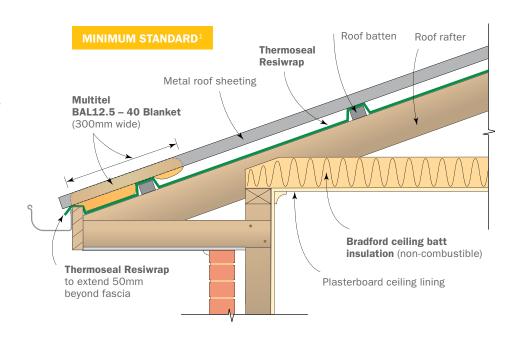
b Fascia Detail – Metal Roof (BAL12.5 – 40)
